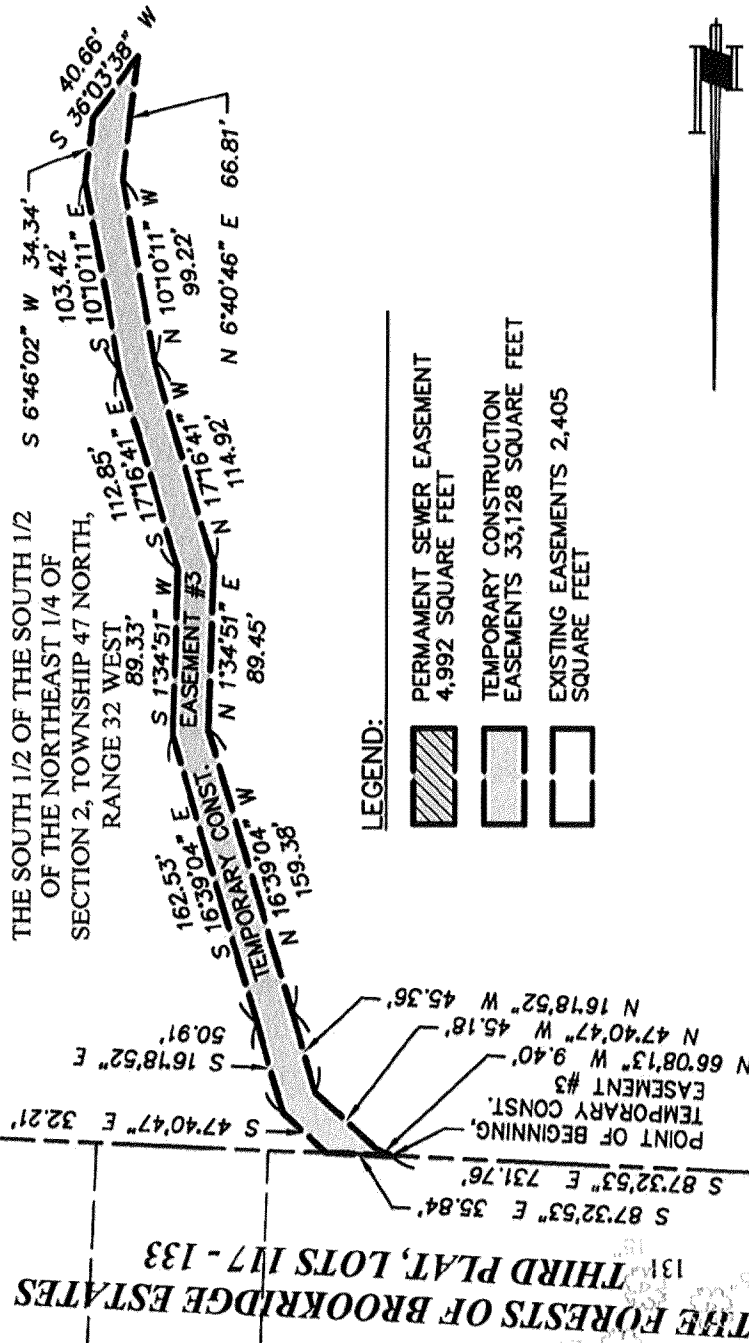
EXHIBIT A WINTERSET WOODS & STERLING HILLS TRUNK SEWER MAIN
